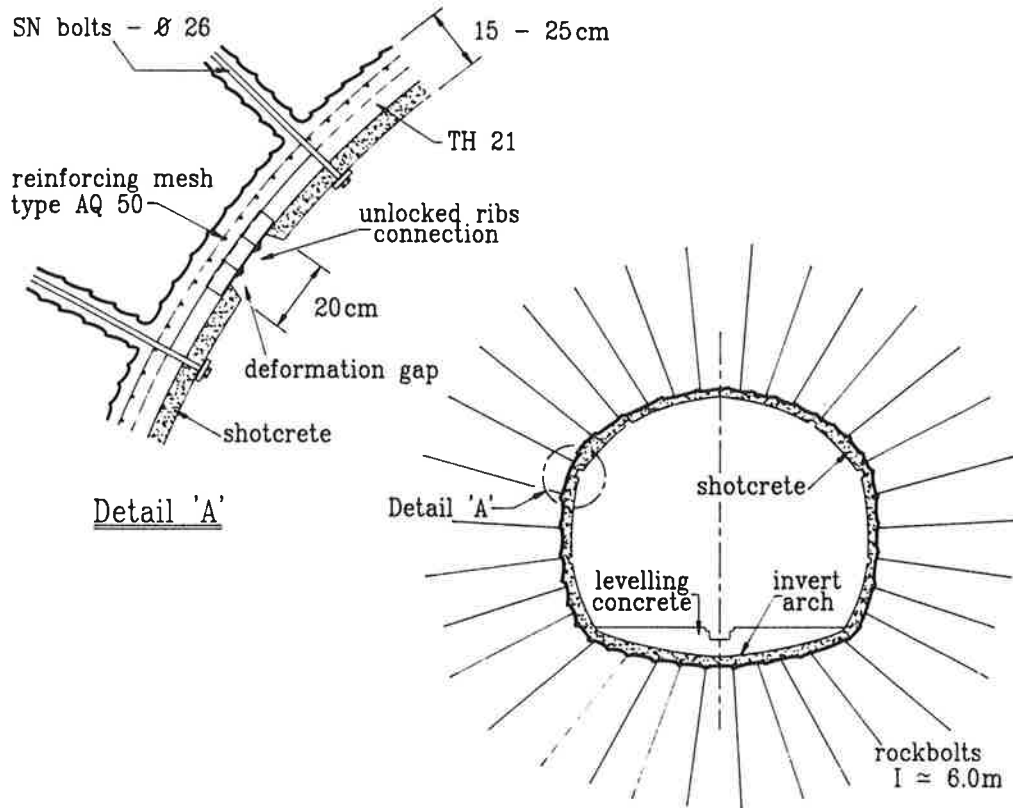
Where large deformations take place in the tunnel walls it is important to have a highly flexible lining to interact with the deformations. The figure shows an example from the Tauern tunnel where the initial lining of shotcrete and rock bolts was designed with longitudinal joints to meet this requirement (adapted from Amberg and Cristini, 1986).
